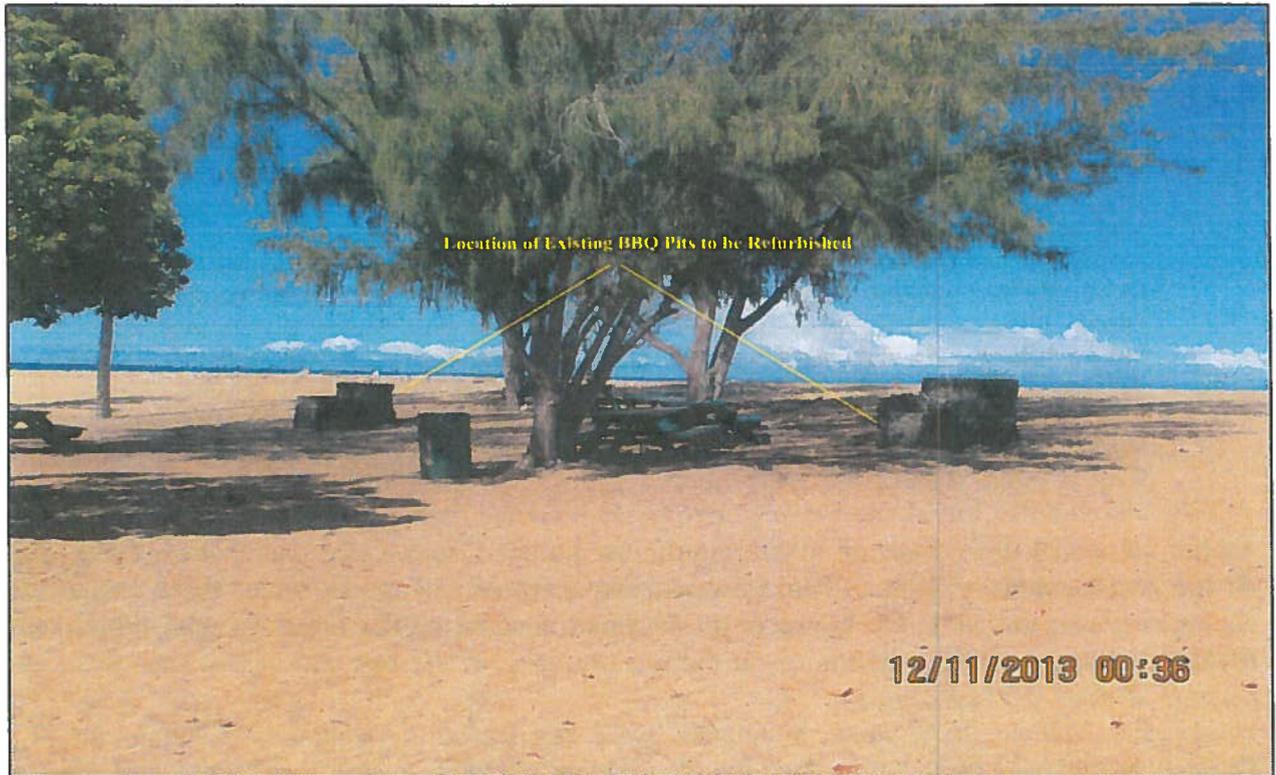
Location of 2 of the existing BBQ pits on the beach which to be refurbished. View is to the west (*makai*).
